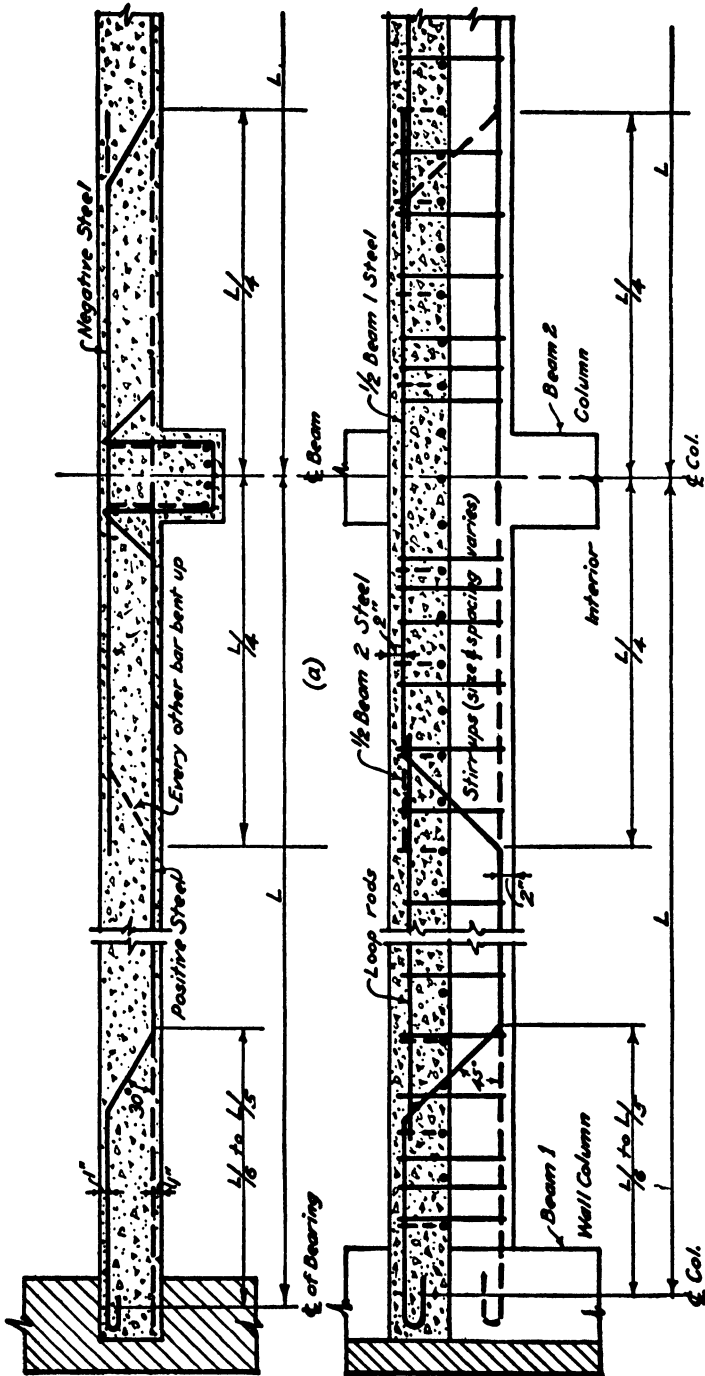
Bar Bending for Concrete Slabs and Beams.
